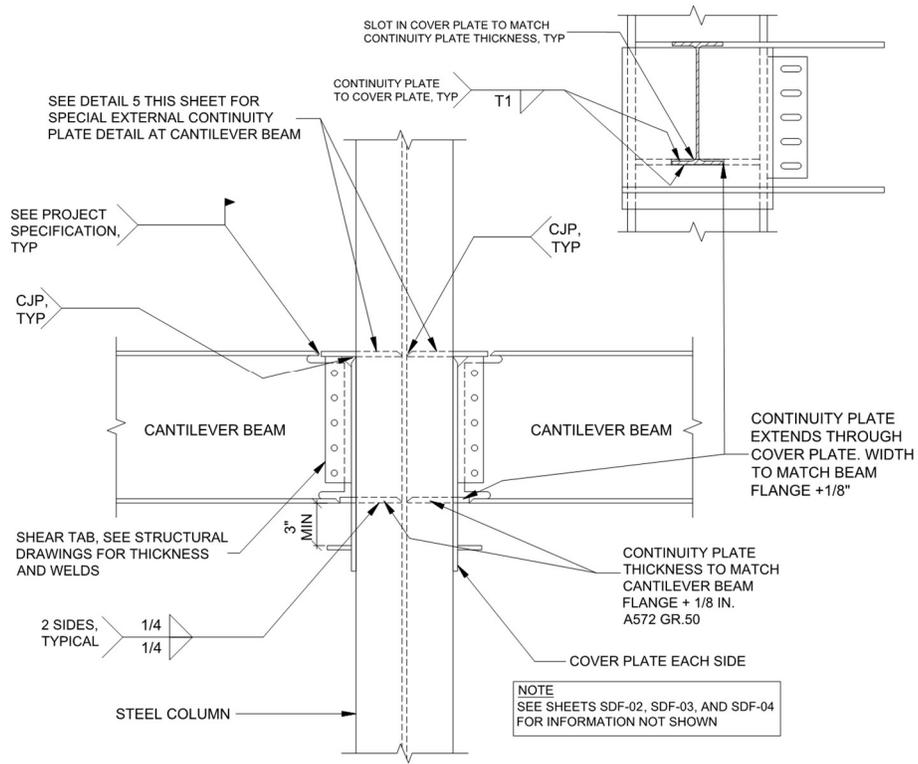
Orthogonal gravity cantilever when cantilever depth is less than DFF beam depth.
